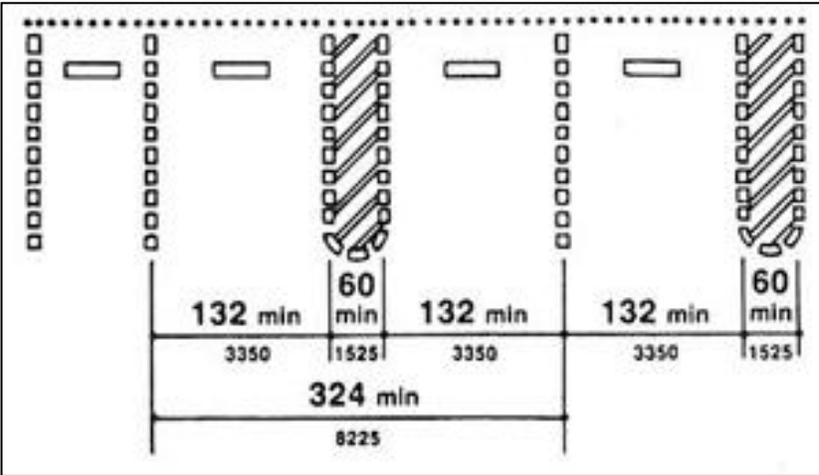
Gravel parking lot with paved accessible spaces and paths..
